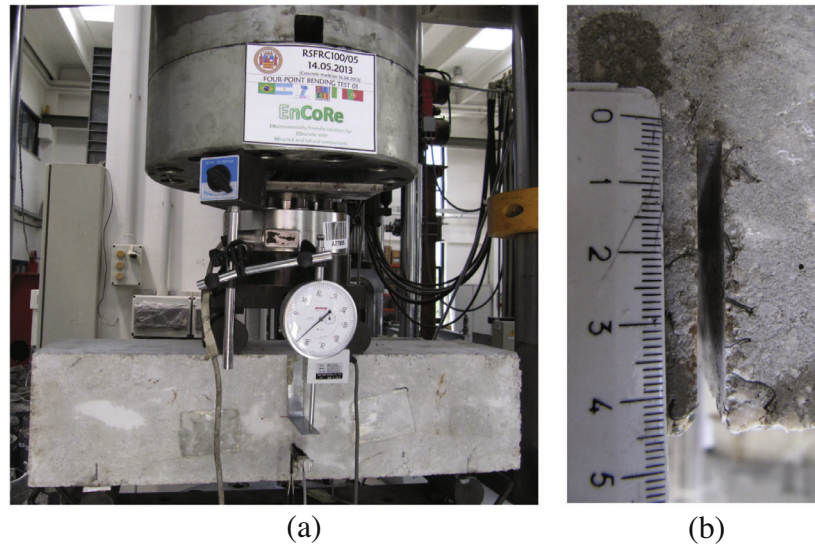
Four-point bending test: (a) experimental set-up and (b) the vertical notch at the bottom surface of the specimen.
